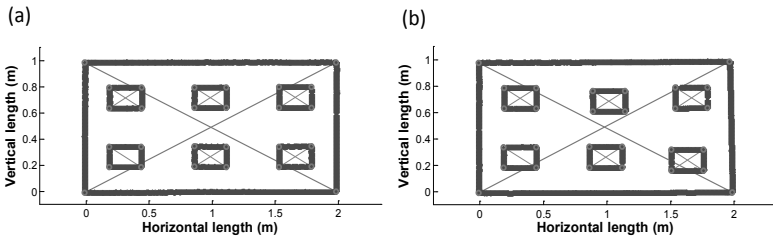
Edge and corner extraction results: (a) Precast slab I; (b) Precast slab II
